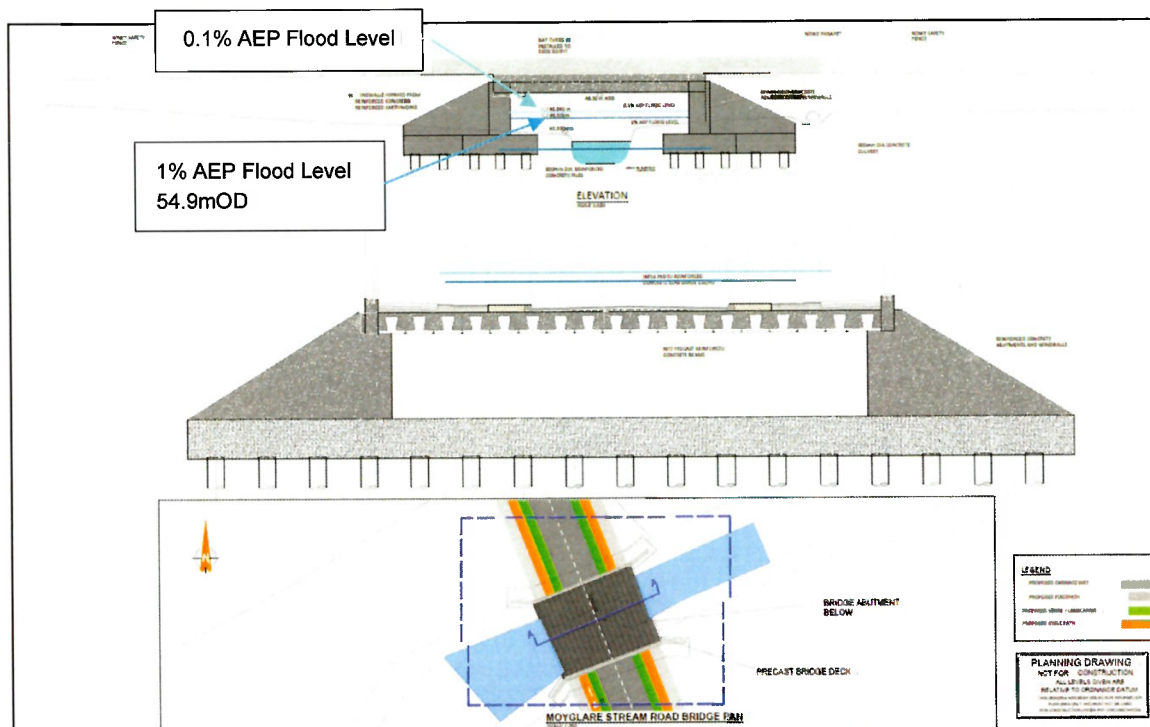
Proposed Bridge Layout- Road Bridge 2
